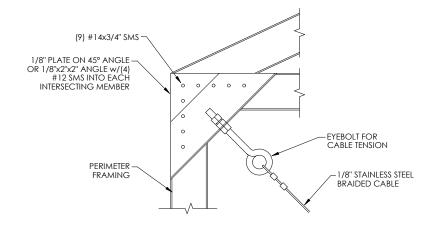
DETAIL "K" GUSSET CONNECTION SCALE: NTS
